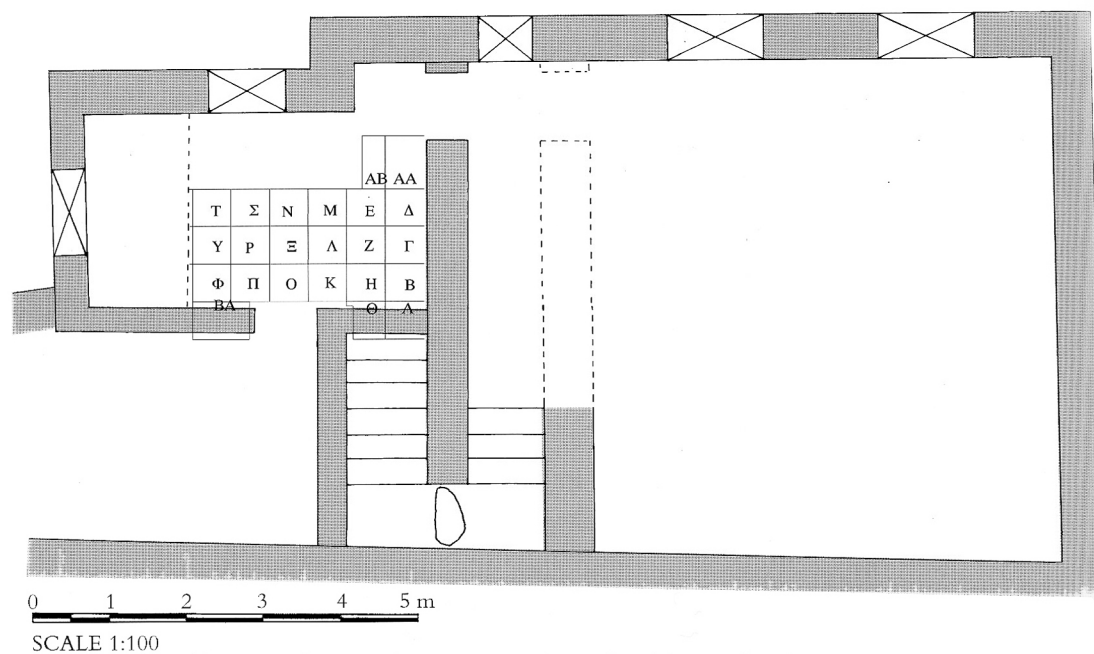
Northwest corner of palatial building, 1st floor with reconstruction of archive and staircase.
